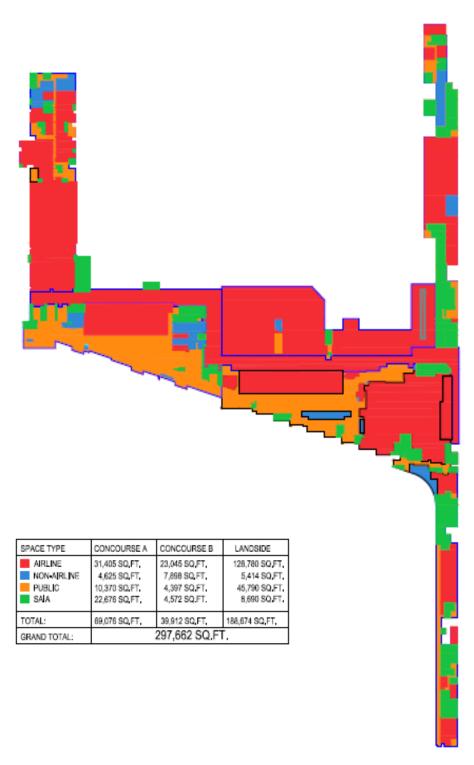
Terminals A and B - Departures Level Floor Plan
